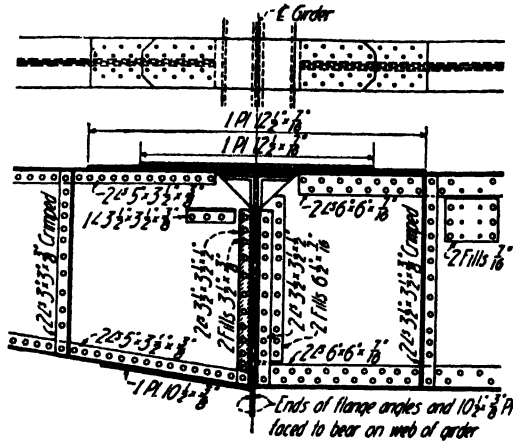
j*. Strap Plates for Cantilever Beams of Girder Spans.
